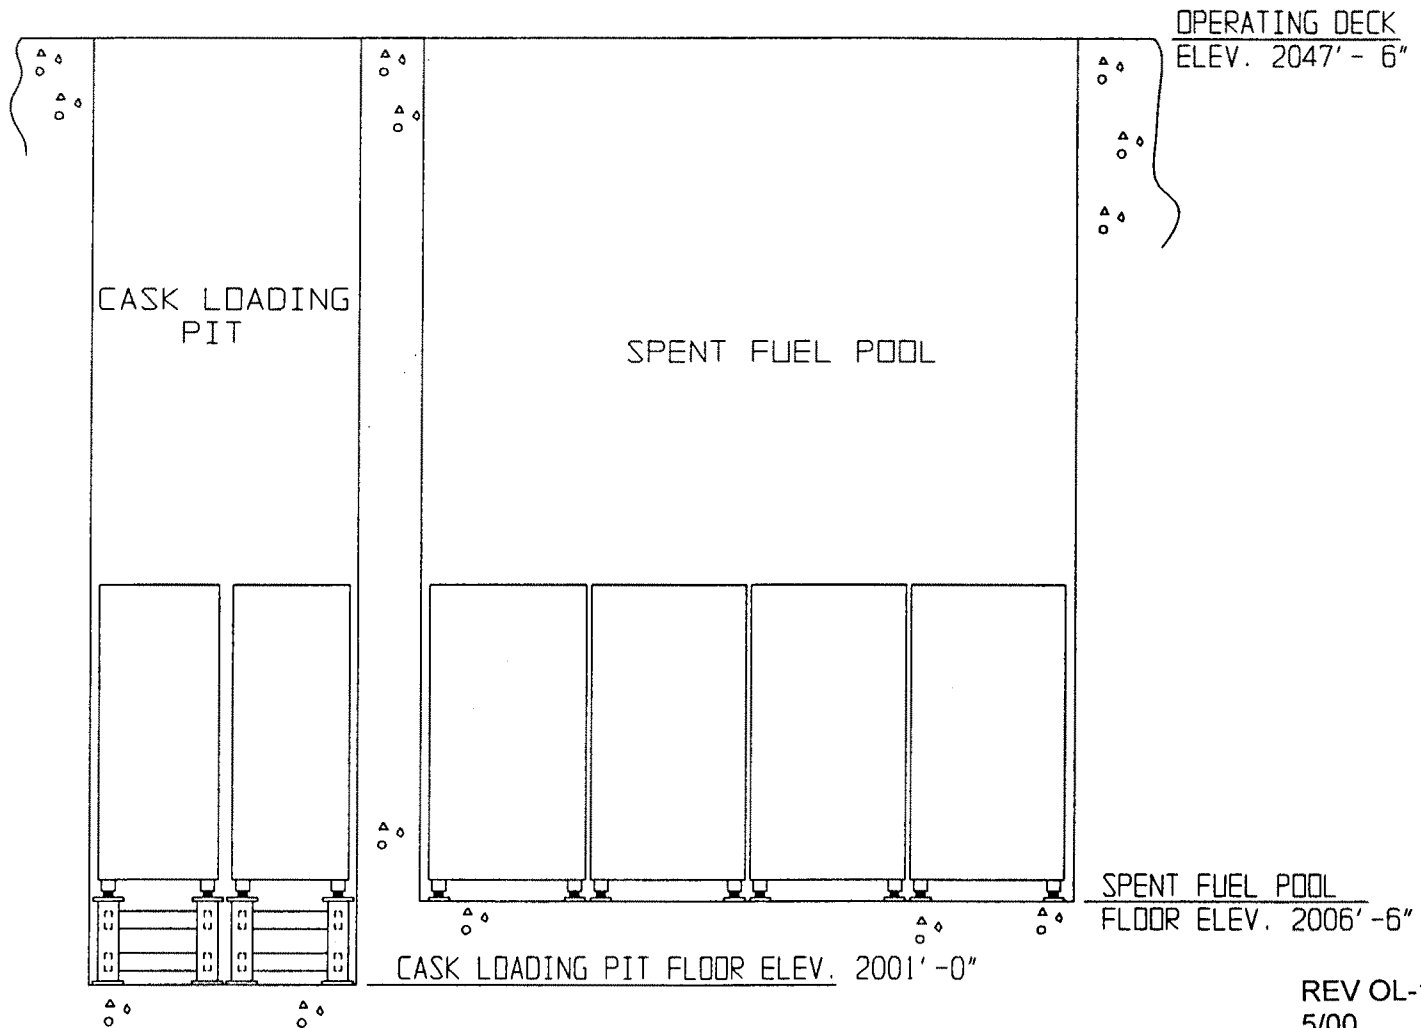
ELEVATION VIEW OF RACK LAYOUT
